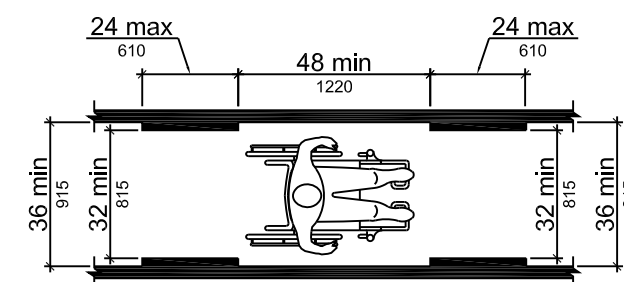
B-403.5.1 CLEAR WIDTH AN ACCESSIBLE ROUTE
